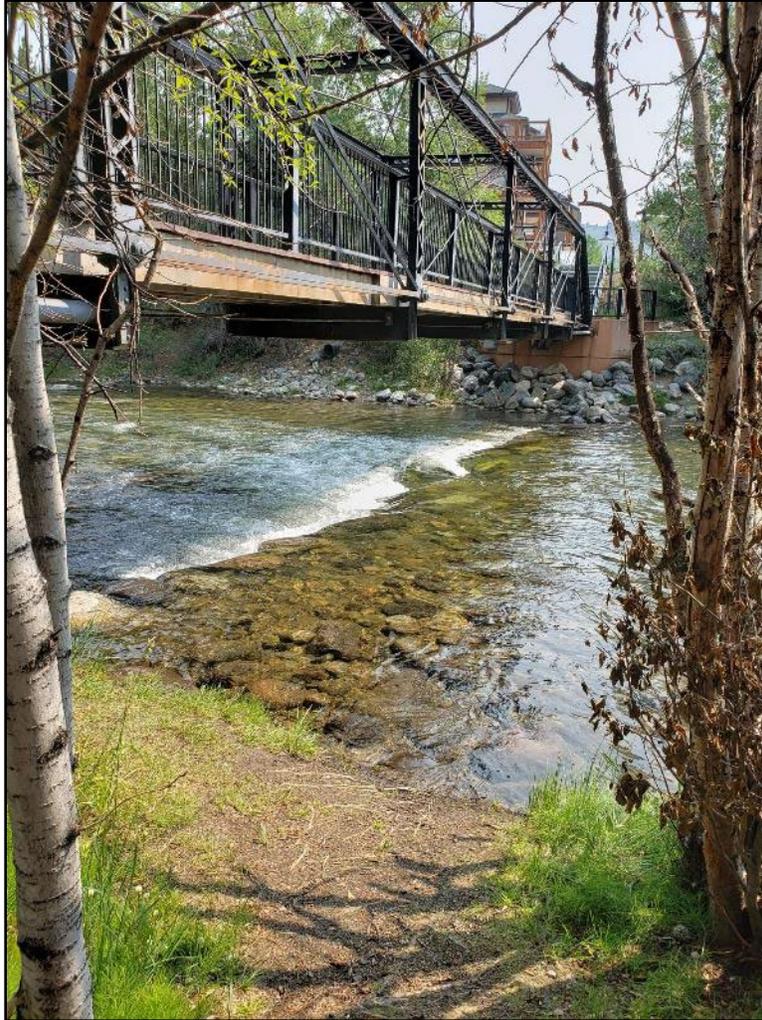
July 12, 2021, Blue River reconnaissance Location 3, drop structure under bridge
